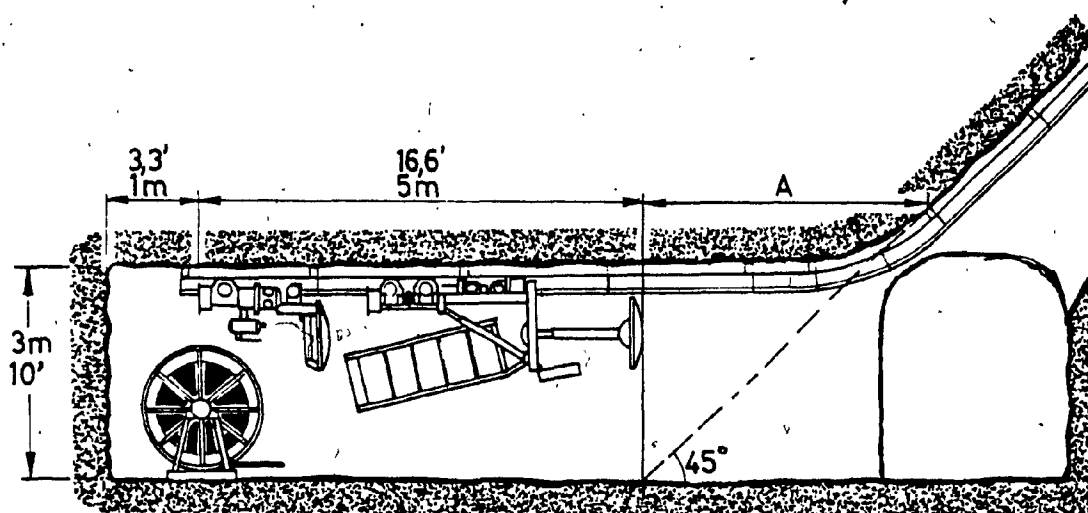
Dimensioning of Horizontal Cut out for an Inclined Shaft
